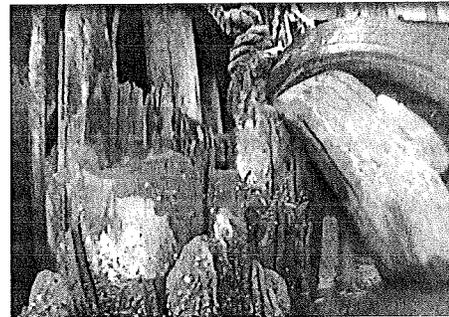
South fender system, dolphin at east end of fender showing typical broken piles in poor condition due to rot, section loss, impact damage and worms, looking west.
